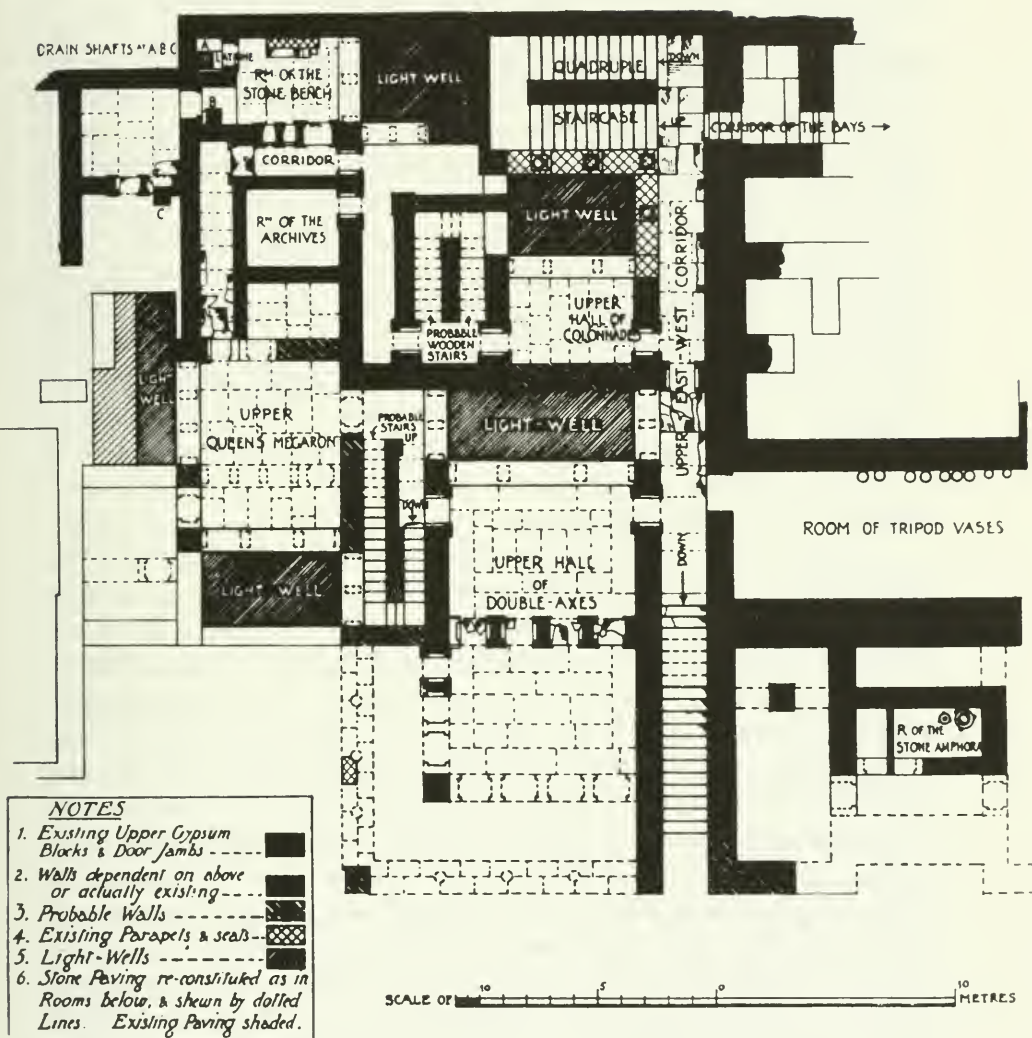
UPPER FLOOR PLAN OF DOMESTIC QUARTER AND ADJOINING HALLS.
